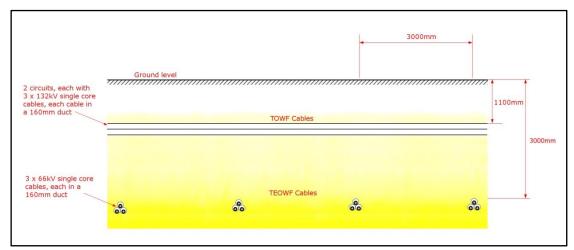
General arrangement of TOWF and TEOWF cable crossing
